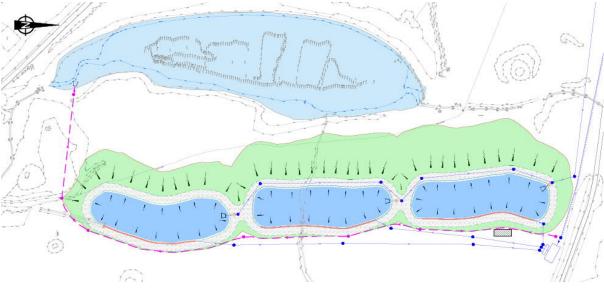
shows the proposed layout for Option 1 (refer to Appendix C for more details).
